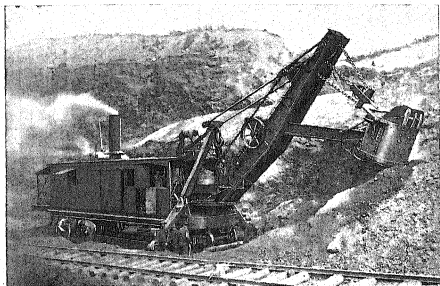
95-ton Steam Shovel at Work in the Culebra Section
